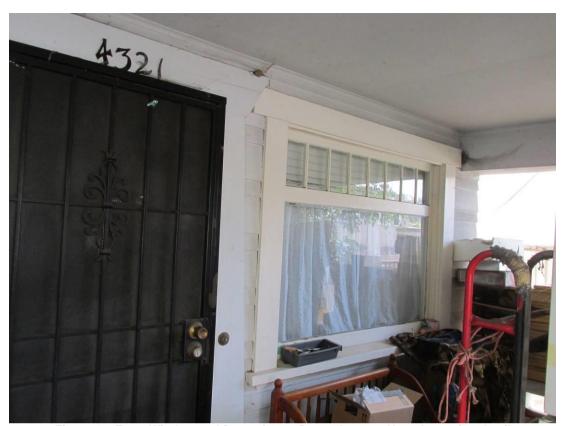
Front Window and Door of 4321 Burns Avenue. Note the casing detail.
